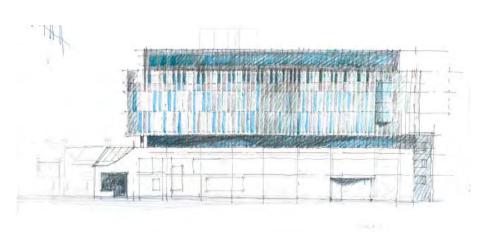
King Street elevation - tripartite arrangement of base, middle and top
